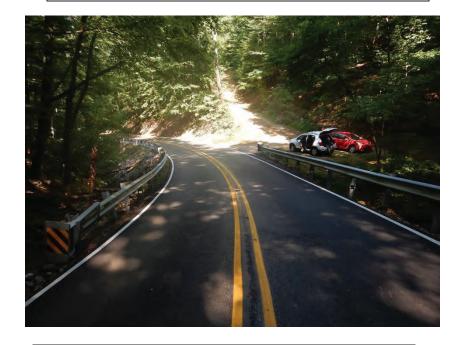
Facing Southeast Towards Strugguerdix F -  $25\,$
